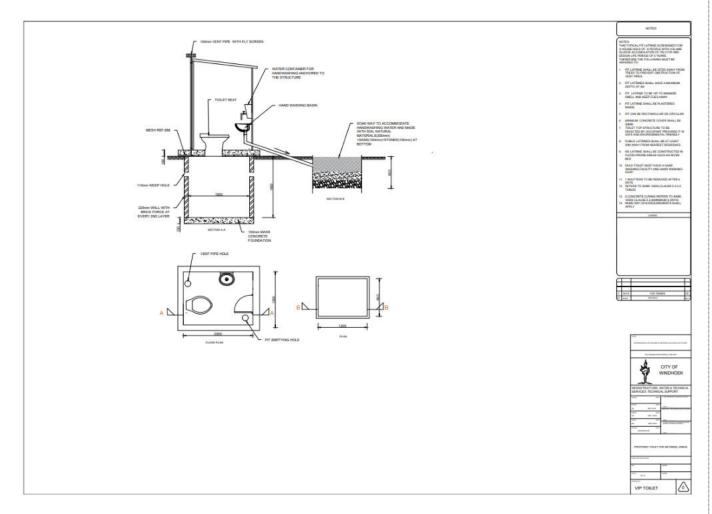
Dry toilet (pit latrine) layout by WMC - A
